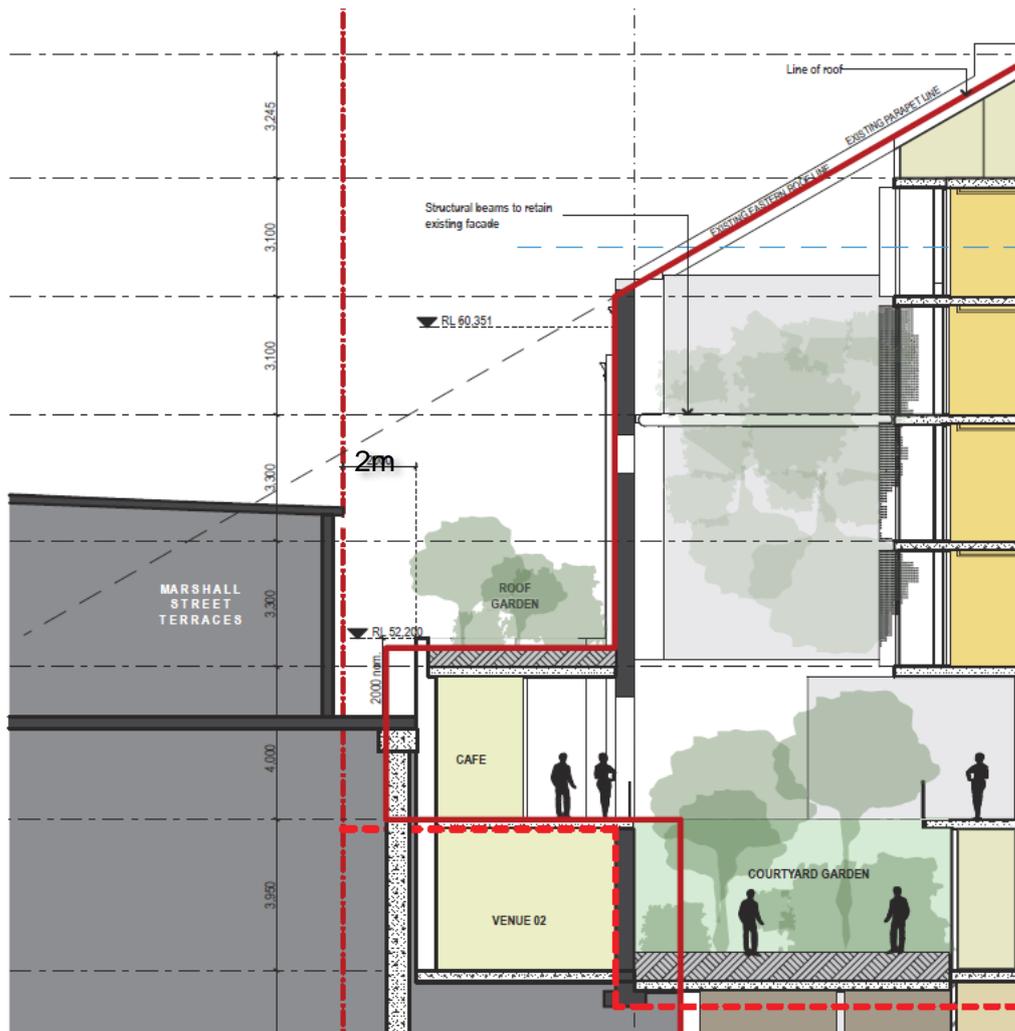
Concept cross section - relationship to Rose Terrace properties and 2 metre setback provided
